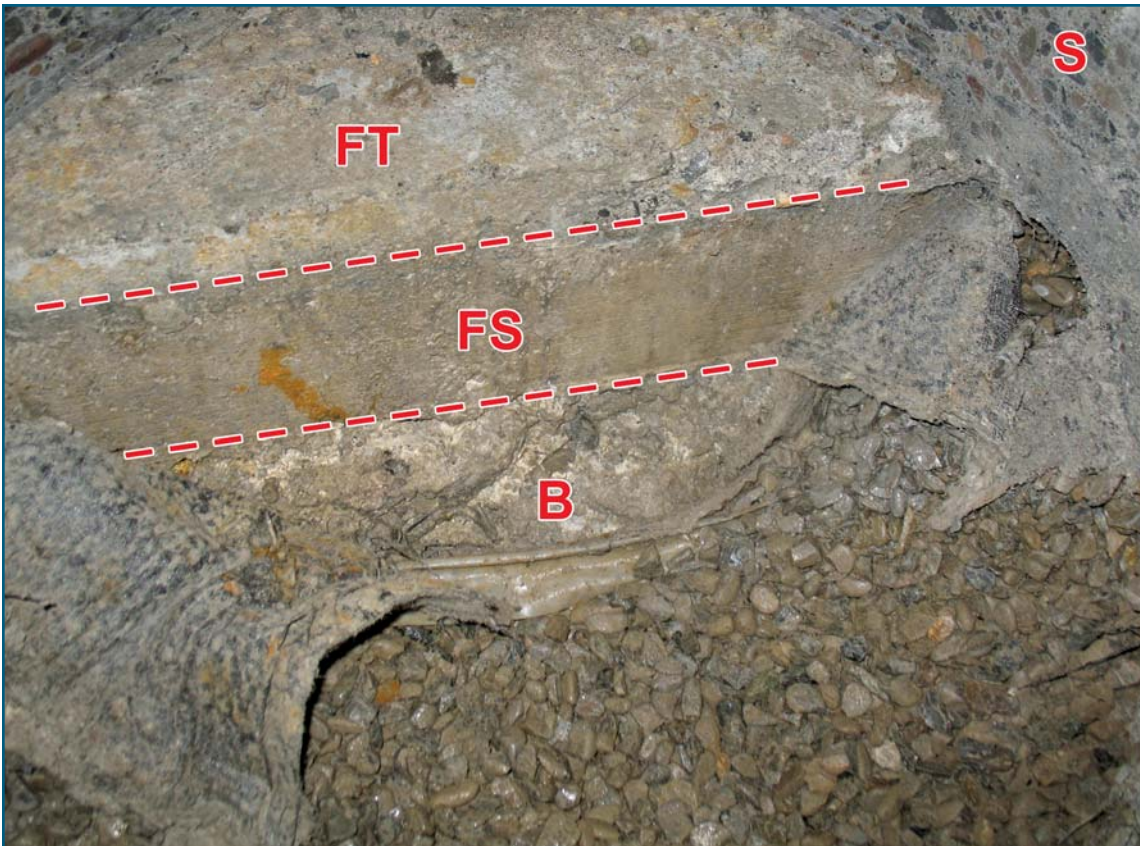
Smooth side of footing (FS) with bulging concrete (B) below. Footing top – (FT); Slab – (S).
